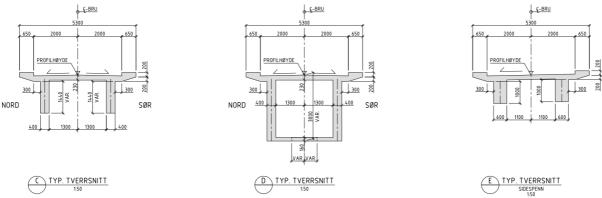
Top deck cross section profiles of bridge spans 1-7 all dimensions in mm [15, 16, 19].
